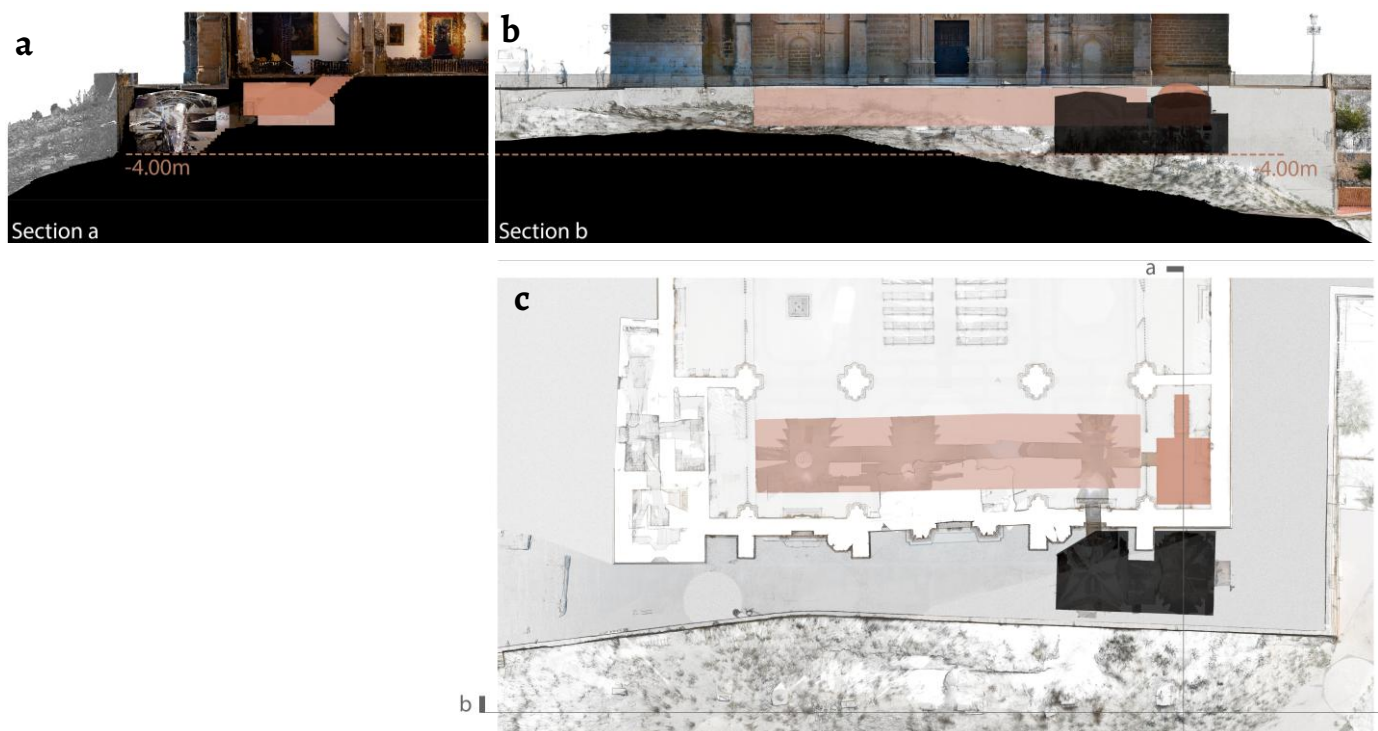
Sections through the west crypts: a) cross-section; b) longitudinal section; c) floor plan.
